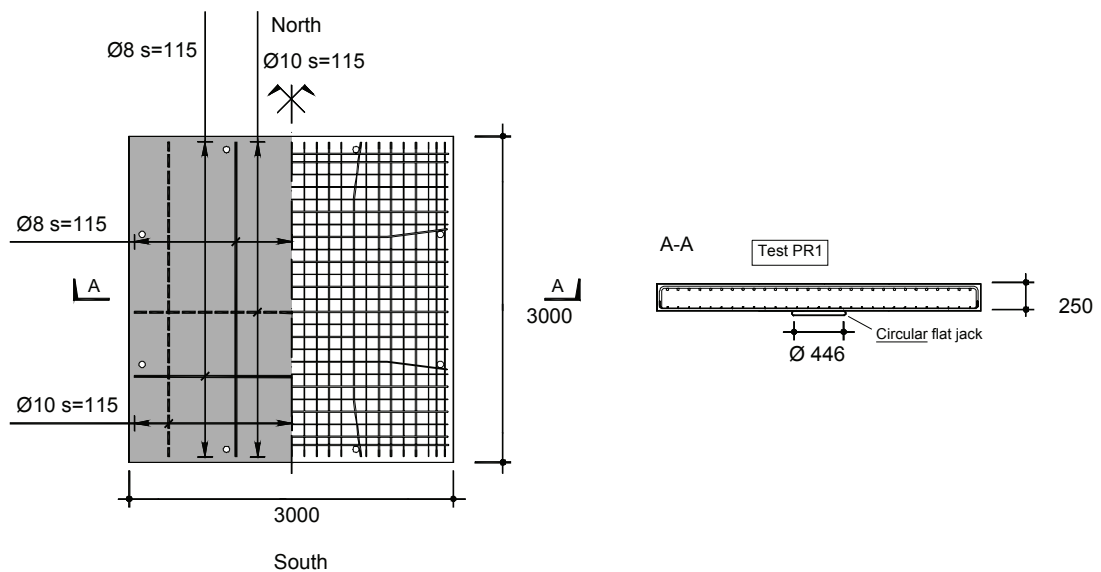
Slab PR1. Dimension and reinforcement layout [mm]
